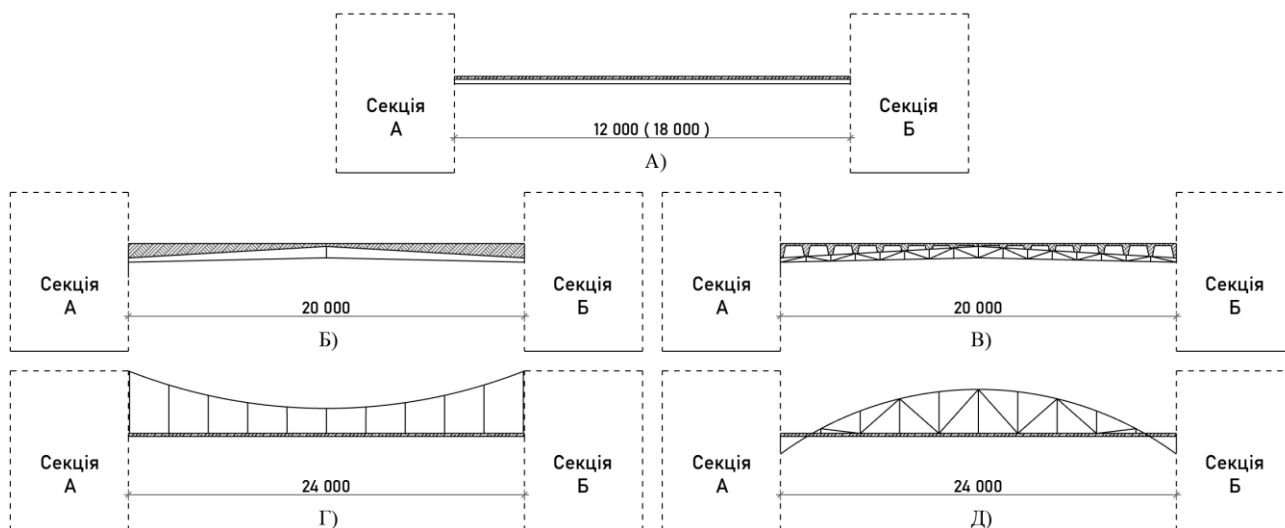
Large-span floor structures: A) U-shaped slab 12m B) Reinforced concrete truss beam C) Steel truss D) Guys E) Arched truss [author's development]
